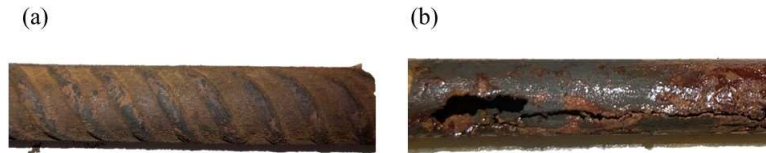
Post-test examination: (a) corroded rebar and (b) corroded steel tube
